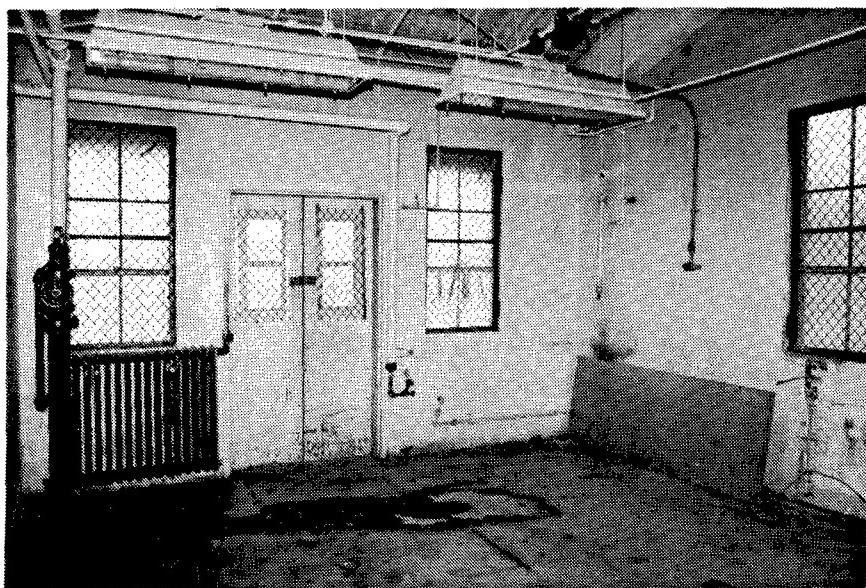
Building 2F-9: Interior view of this Primer Dry House.
